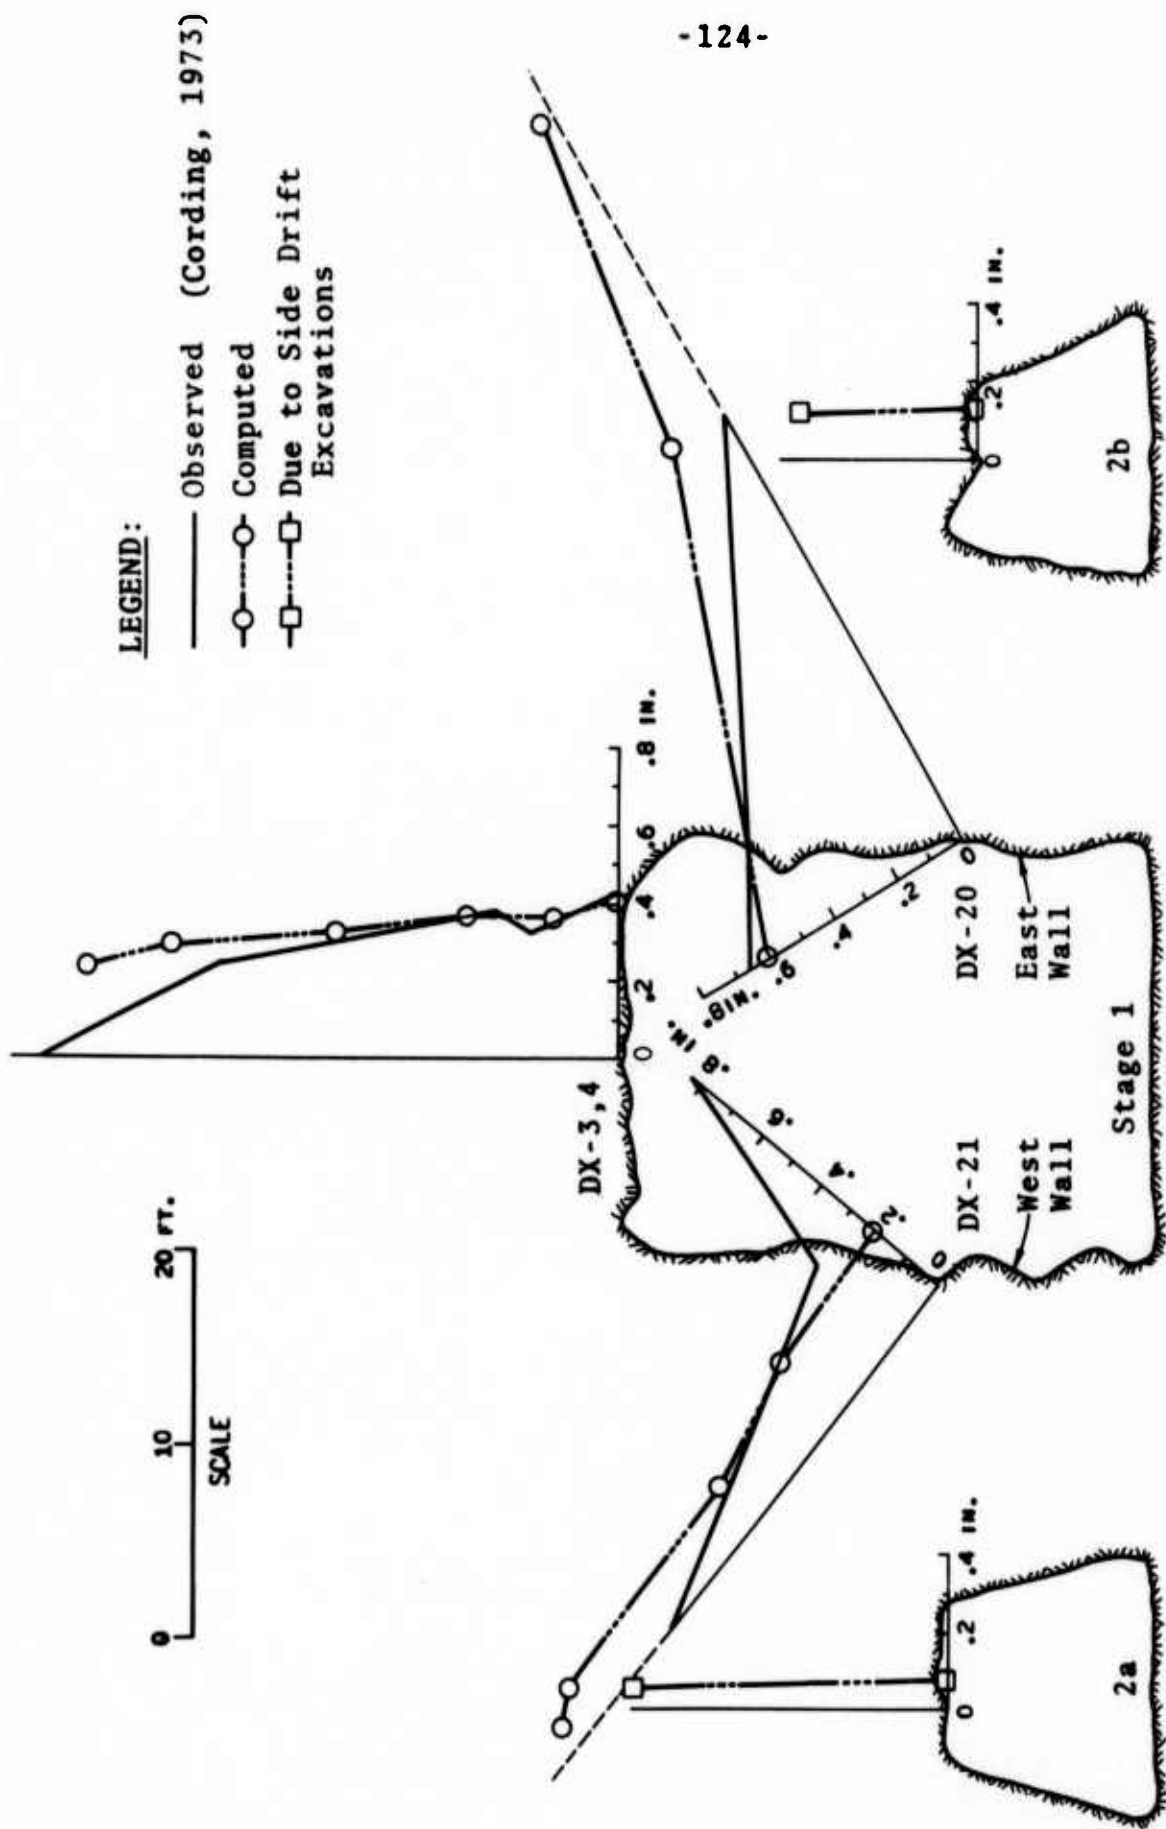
Computed and Observed Movements During Excavation of a Rock Tunnel, Washington D.C. Metro
